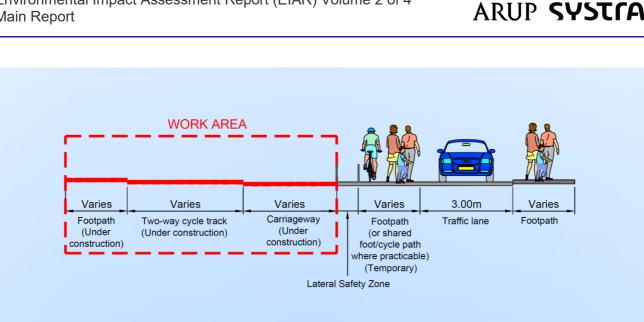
Traffic Management Cross Section, Section 5g - Stage 1
